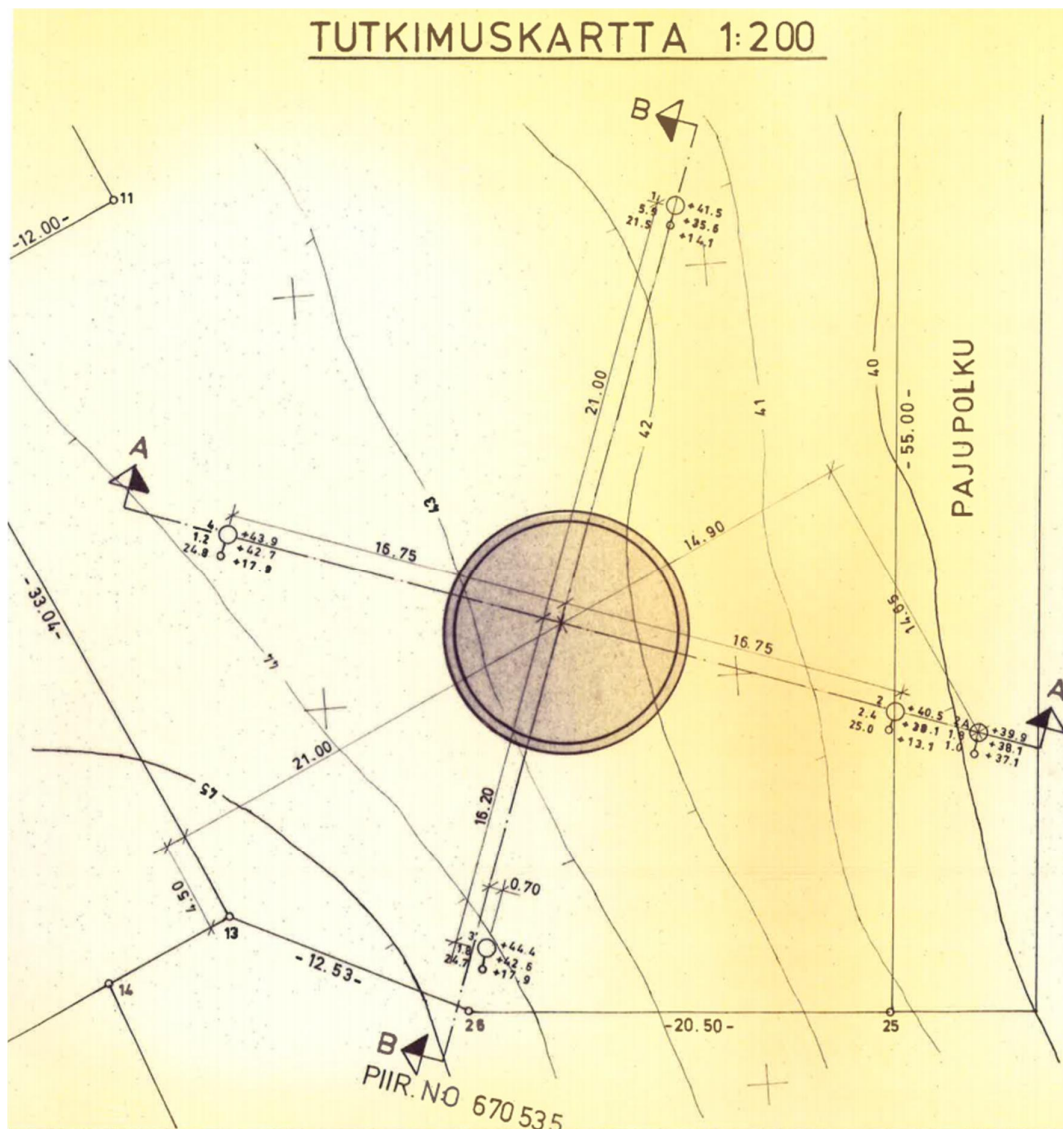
Plan view of Kerava site with the location of drill holes and the water store
